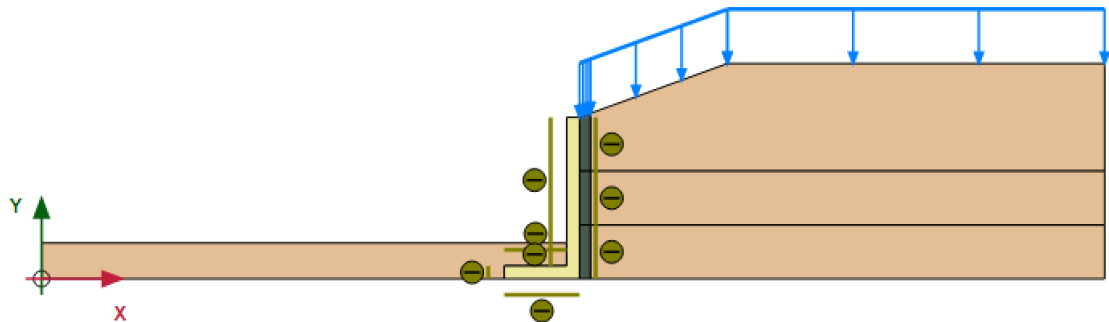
Retaining wall with backfill slope 20° and 0.3m TDA backfill
